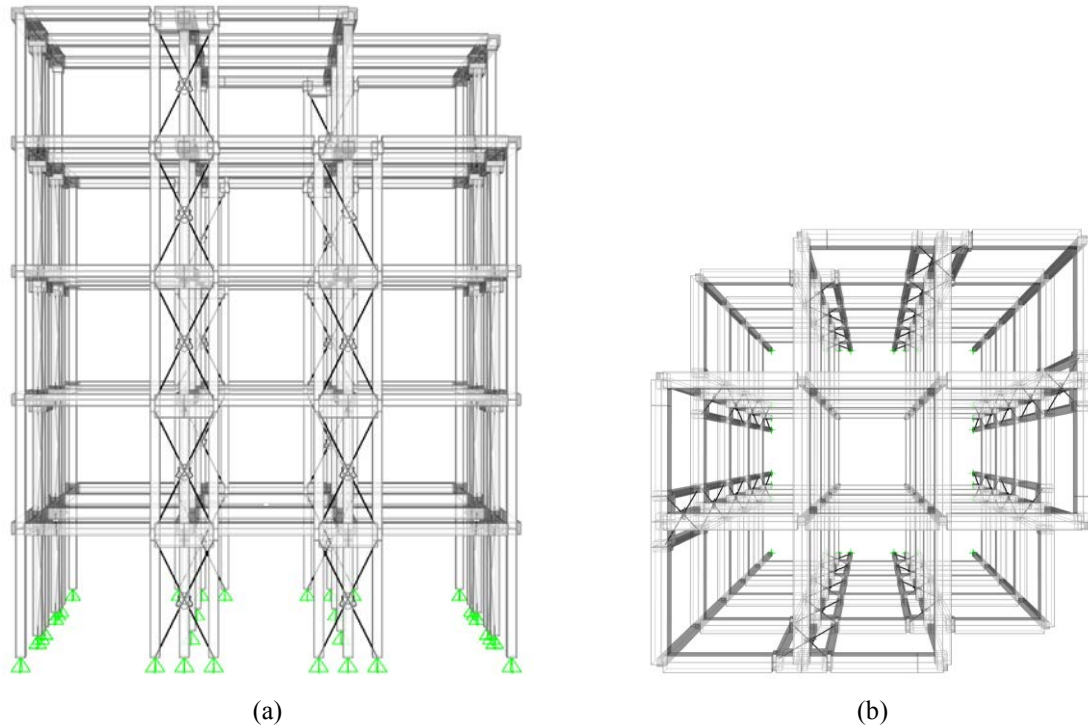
3D structural model of the case study building: (a) side view; (b) top view
